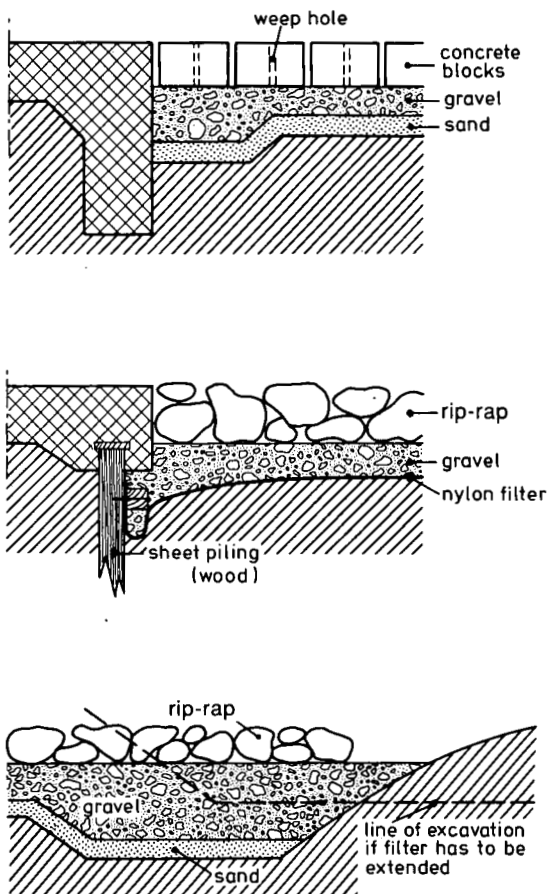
Filter construction details (after Van Bendegom 1969)
